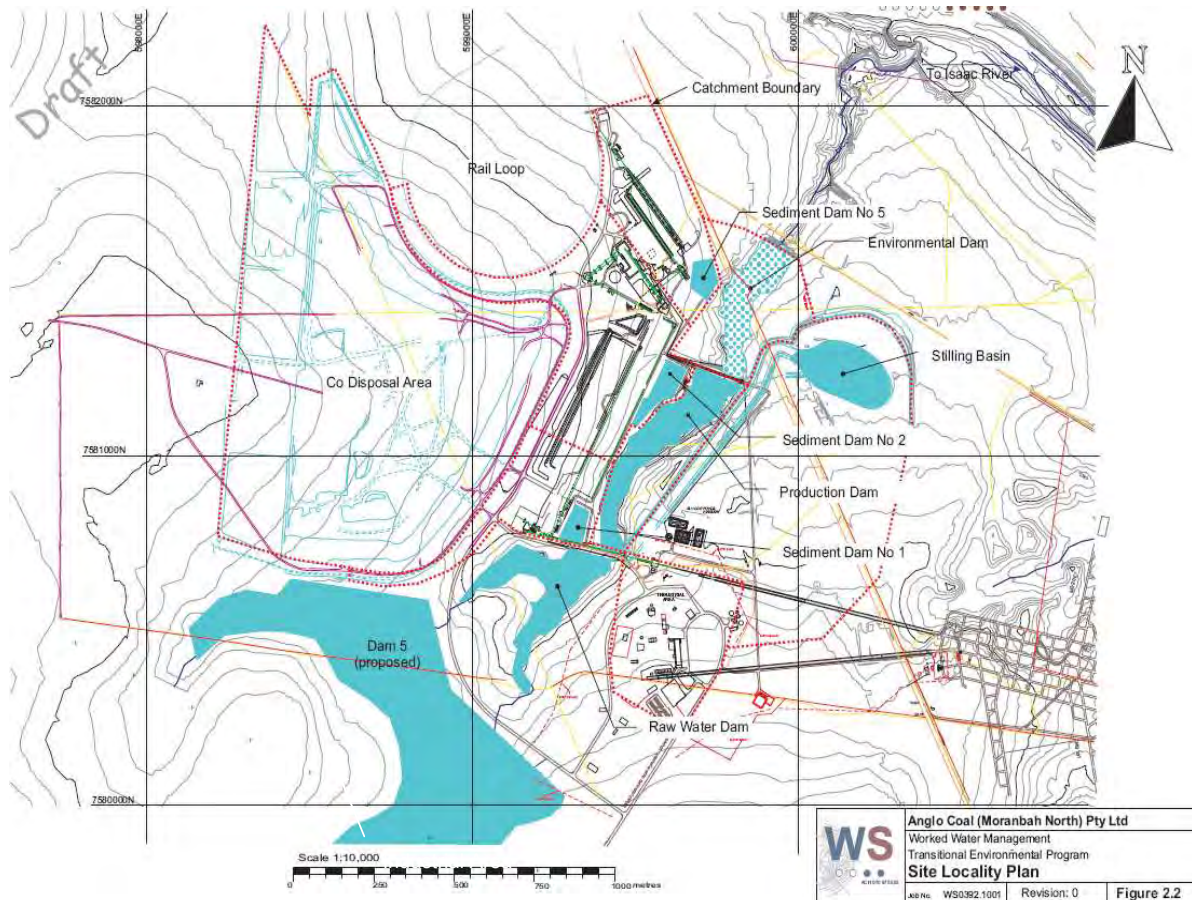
detailed layout plan of the Industrial Area showing the major water management infrastructure including proposed Dam 5
